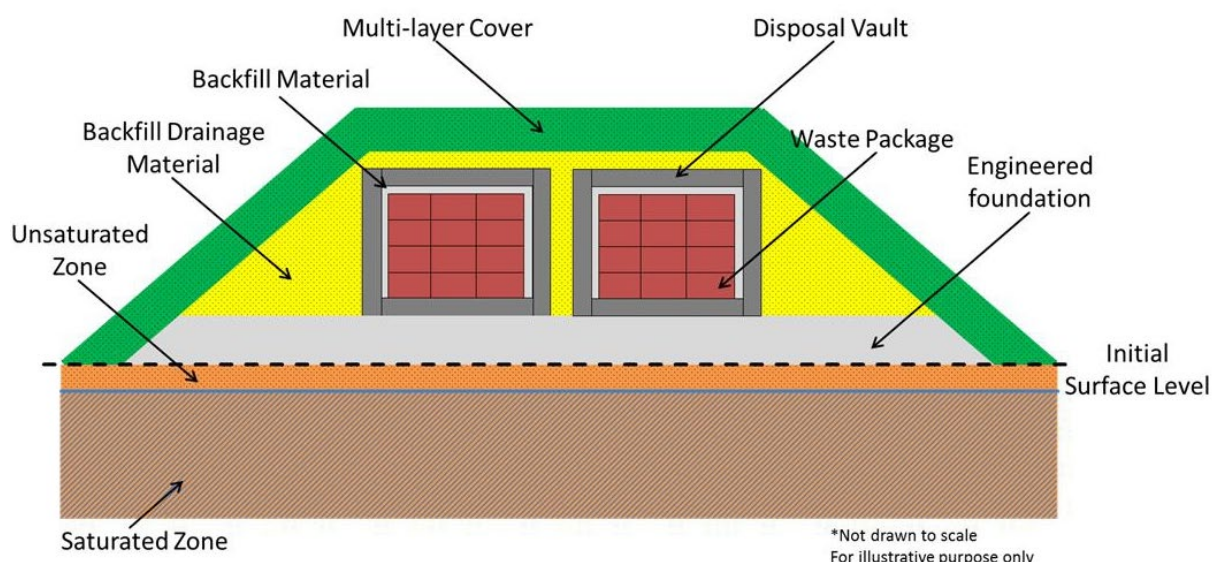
Principal sketch of the planned VLLW disposal at a new site
